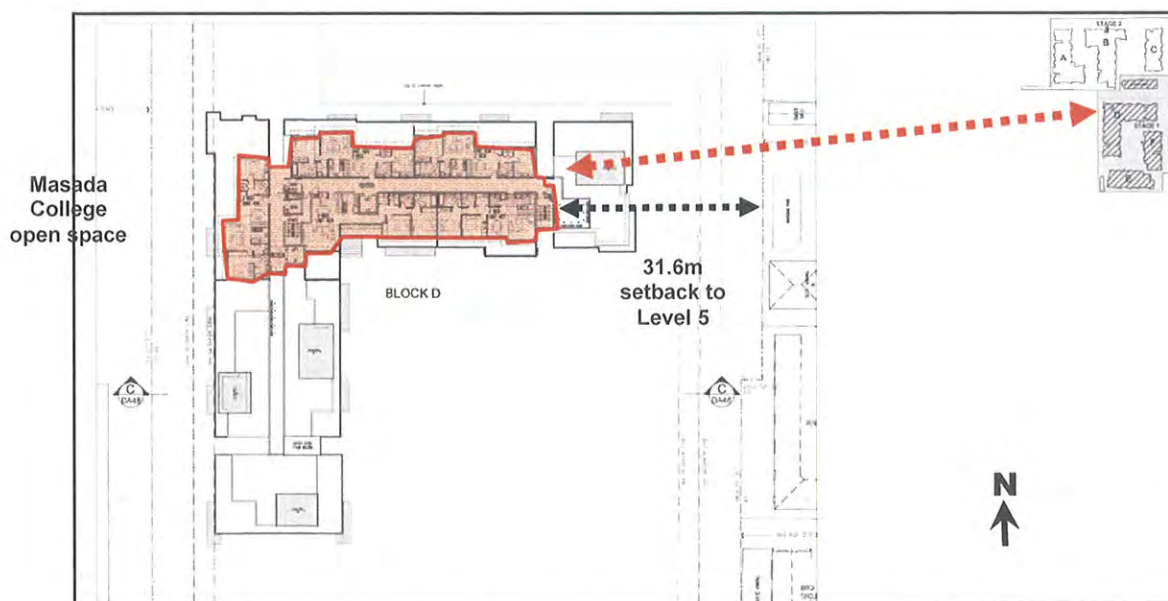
Building D/Level 5 plan detailing extent of non – complying part floor (source: PPR)
